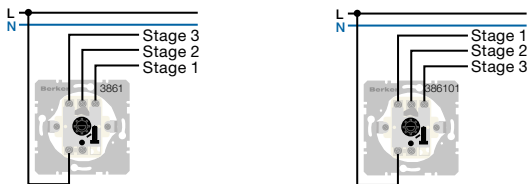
3-step switch with zero position [Order no. 3861] / 3-step switch without zero position [Order no. 386101]
